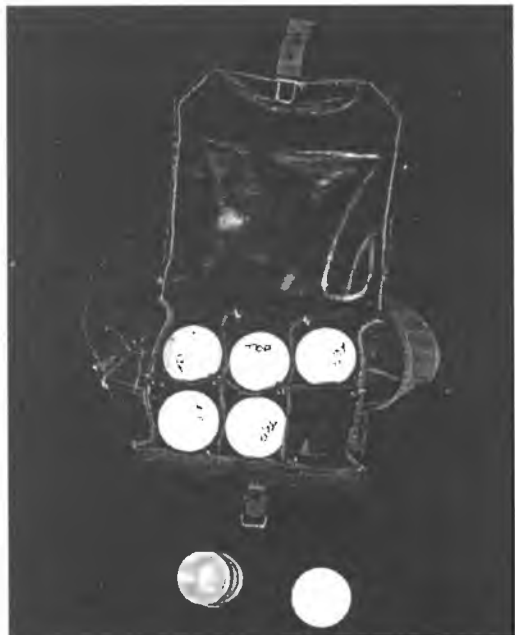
Grout sampling kit used to collect cement grout samples from ground support crews.
